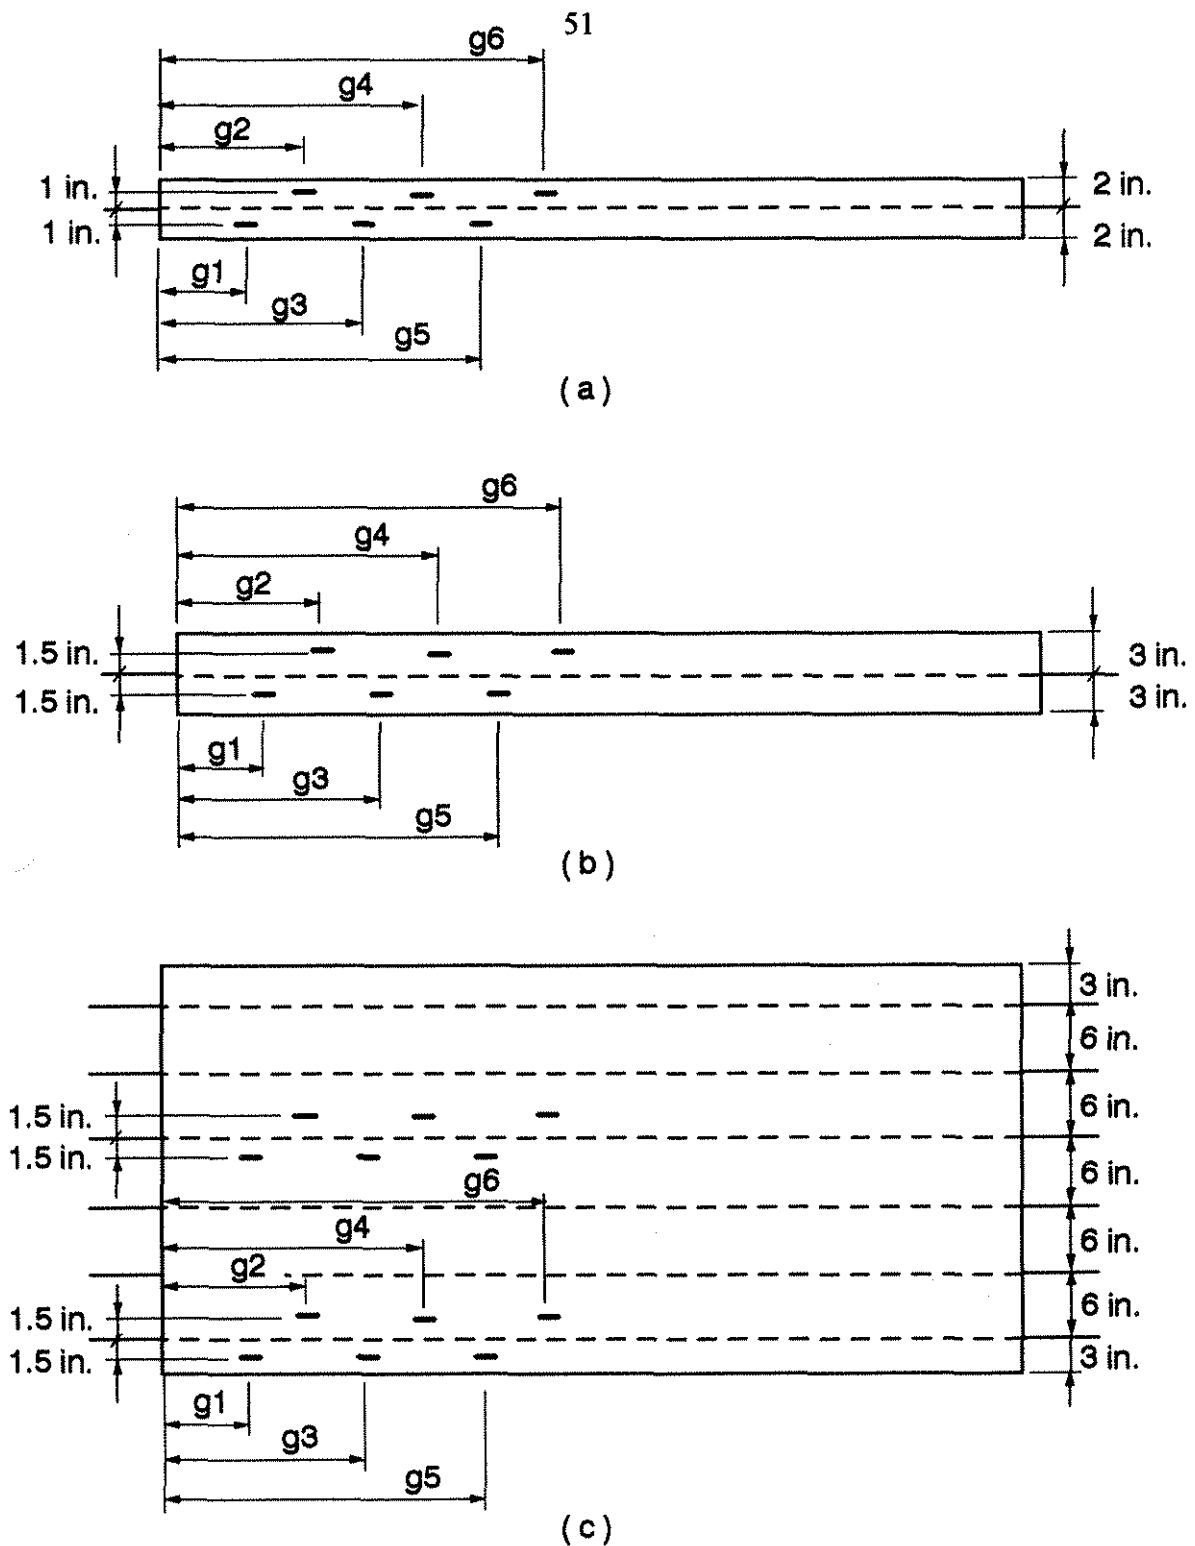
Locations of embedment strain gages: (a) 4-in. wide specimen; (b) 6-in. wide specimen; (c) 36-in. wide specimen
